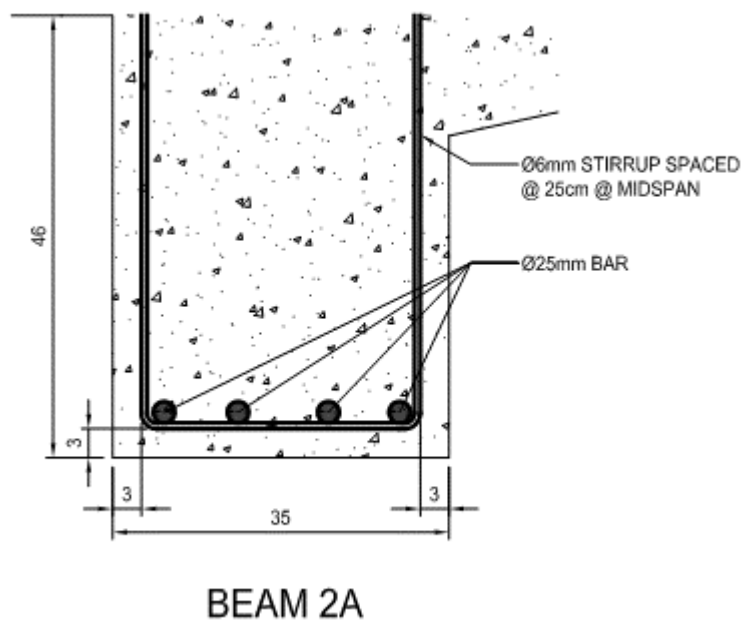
Beam 2A Cross Section with dimensions in centimeters [16]
